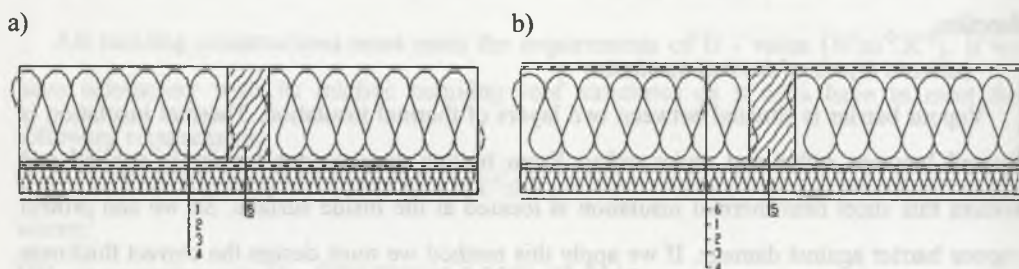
Composition of roof construction: a) void of protected damp-proofing, b) with protected damp-proofing (1 – thermal insulation, 2 – moisture stop, 3 – thermal insulation, 4 – plasterboard, 5 – rafter, 6 – protected dam-proofing)
